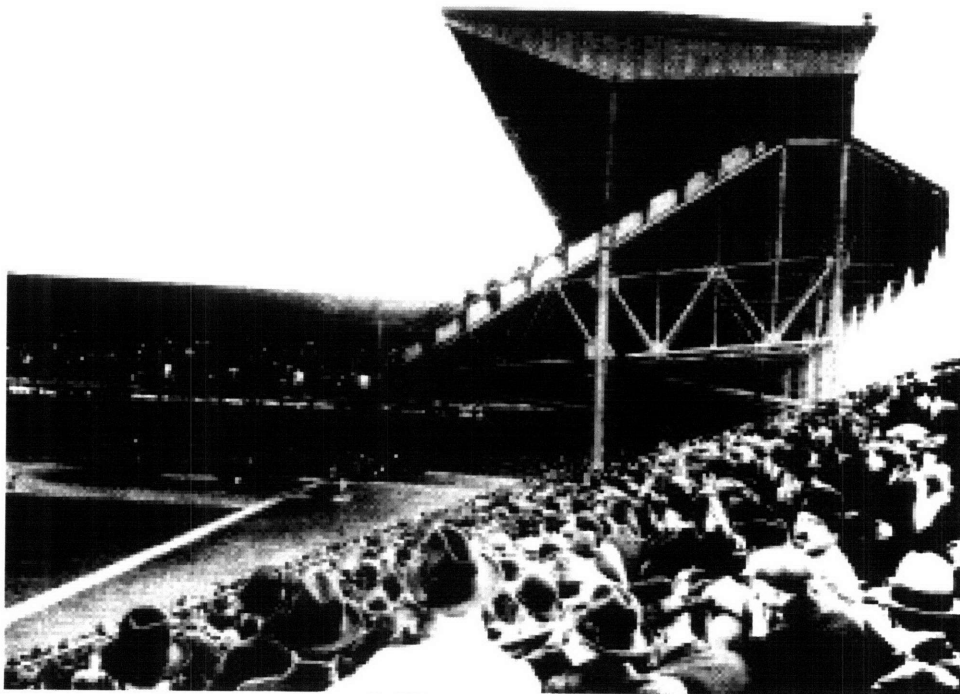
Truss holding upper deck at Ebbets Field [6]
